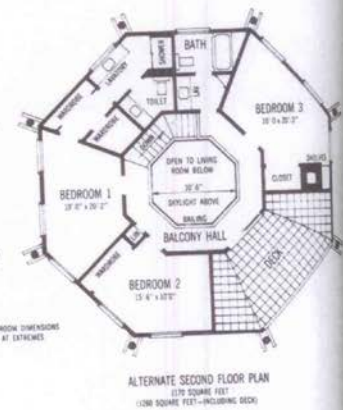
A good design feature: Almost every part of the house enjoys an exterior wall. Also, the first floor living area is extended by three decks outside. Inside, the first-level design gives a studio-like open effect; and kitchen, bathroom, and entry are integrated to insure privacy as well as convenience.
